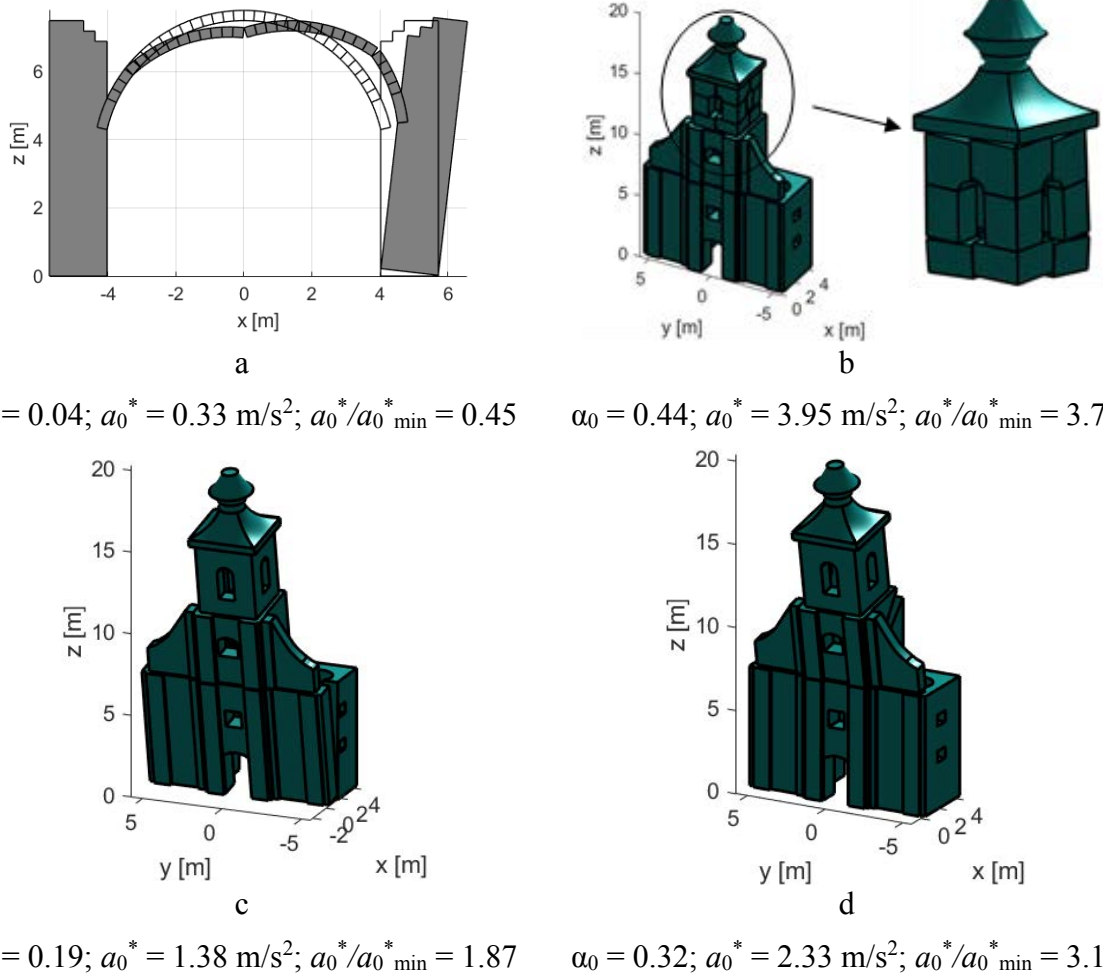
Local mechanisms investigated for the Belint church: (a) collapse of the arch in the central nave, (b) belfry failure, (c) global and (d) partial overturning of the tower-façade system.
